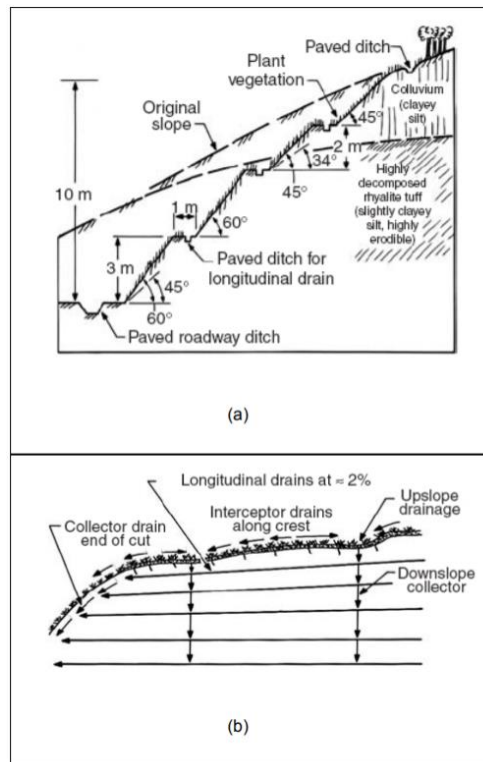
a. Benching scheme for cut (low benches permit maximum inclination to reduce the effect of runoff erosion), b. Longitudinal and downslope drains (Hunt, 2005)
